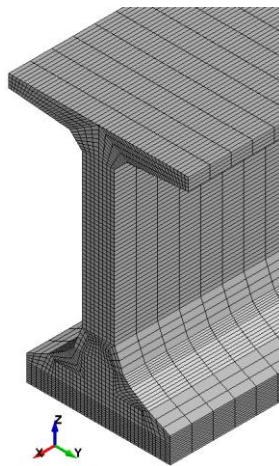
Finite element model of FIB 72 girder depicting solid concrete elements
